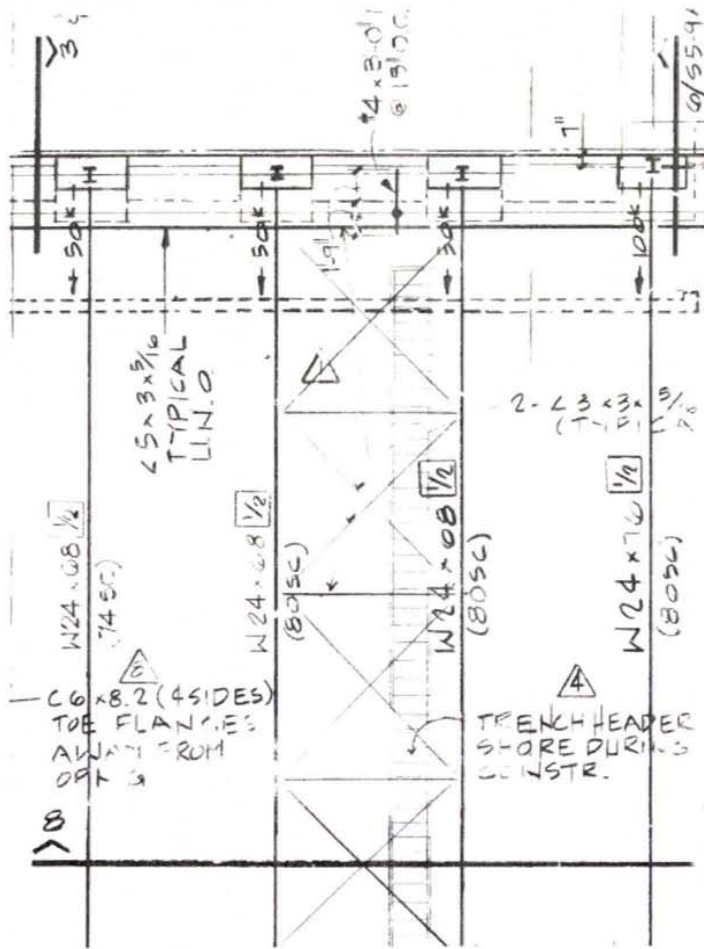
Partial Plan View showing Trench Header on a 1978 project in Houston Texas, designed by CBM Engineers
